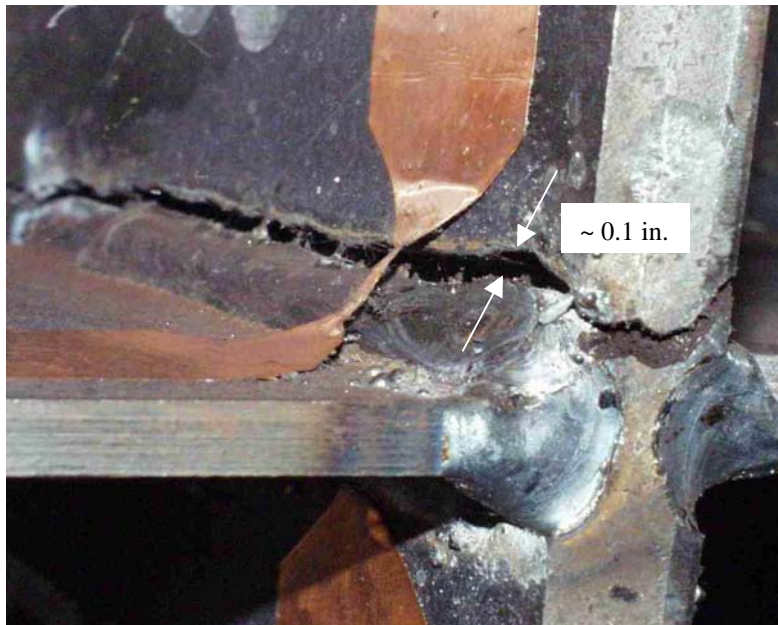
1/16-in. Wide Copper Shape over Crack, Side View
